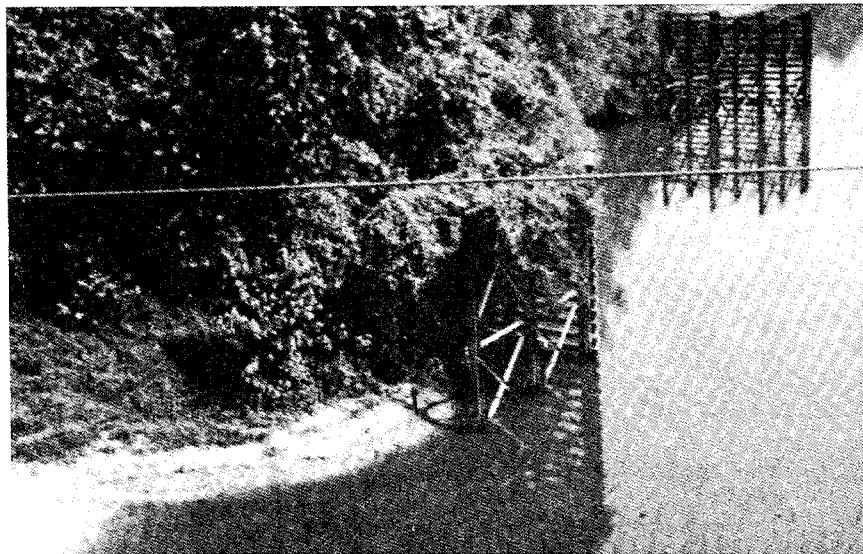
TIMBER PILE AND HORIZONTAL WOOD PLANK DIVERTER. STRUCTURE (AFTER BRICE ET AL., 1978)
